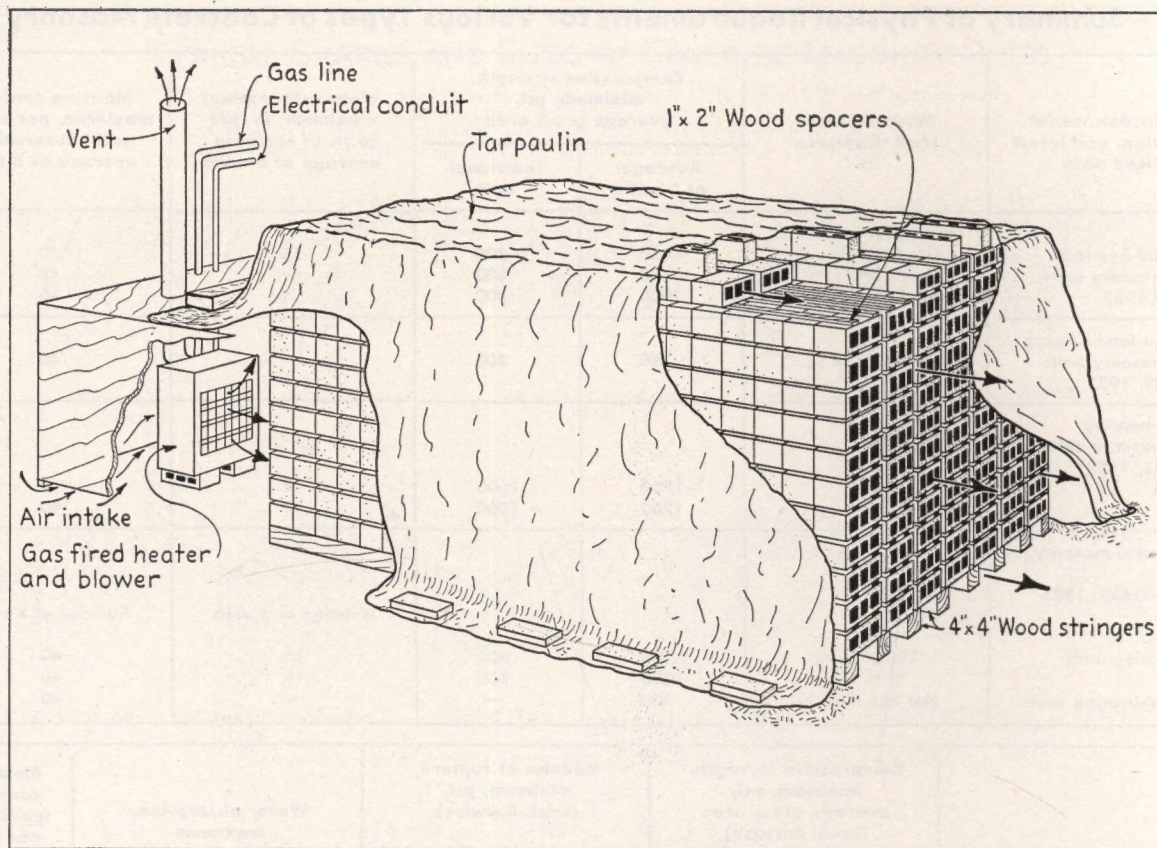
A suggested method for drying concrete block. It can be used indoors or outdoors at plant or job site.
